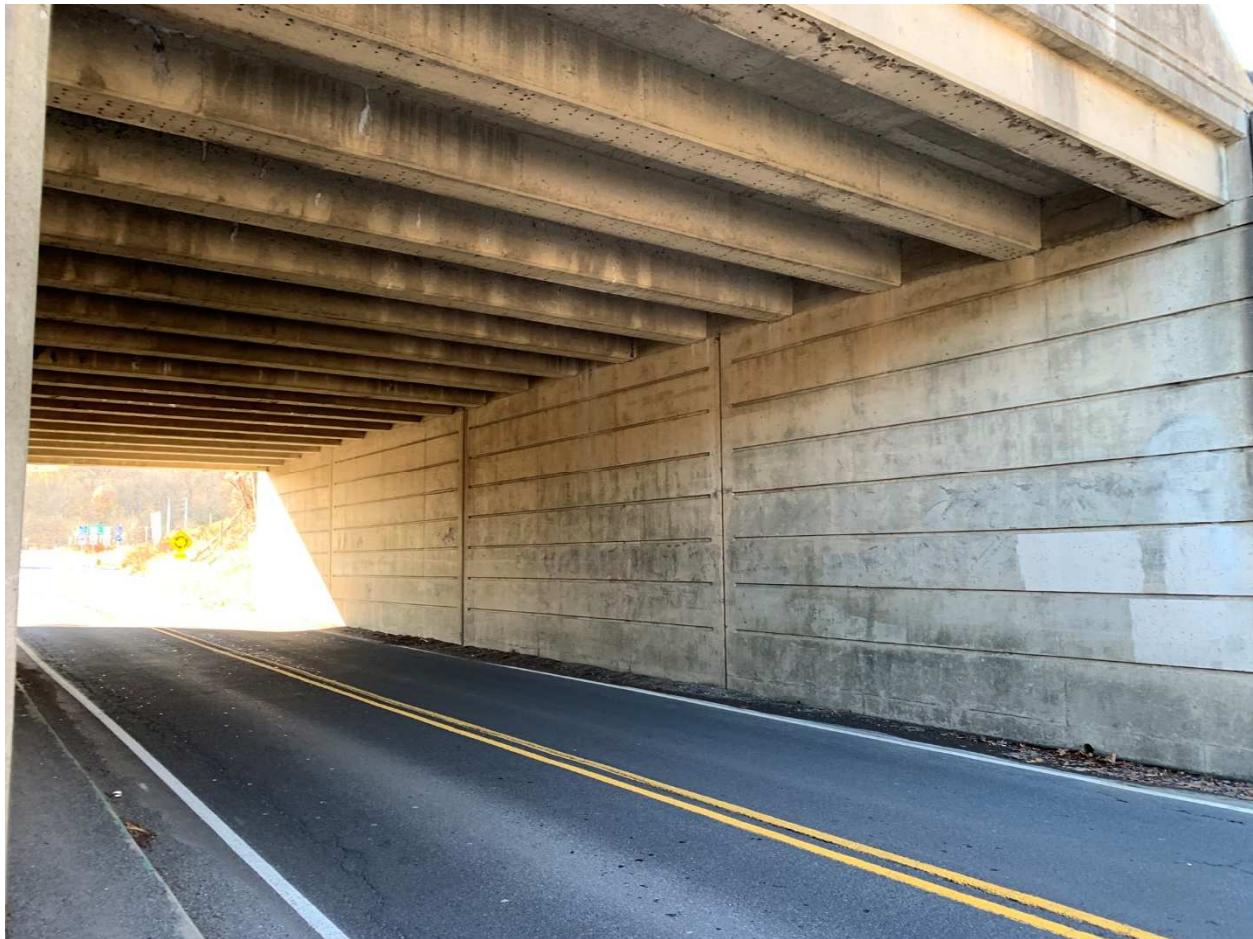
River Road looking westbound from slightly east of Minisink Park Driveway East.
